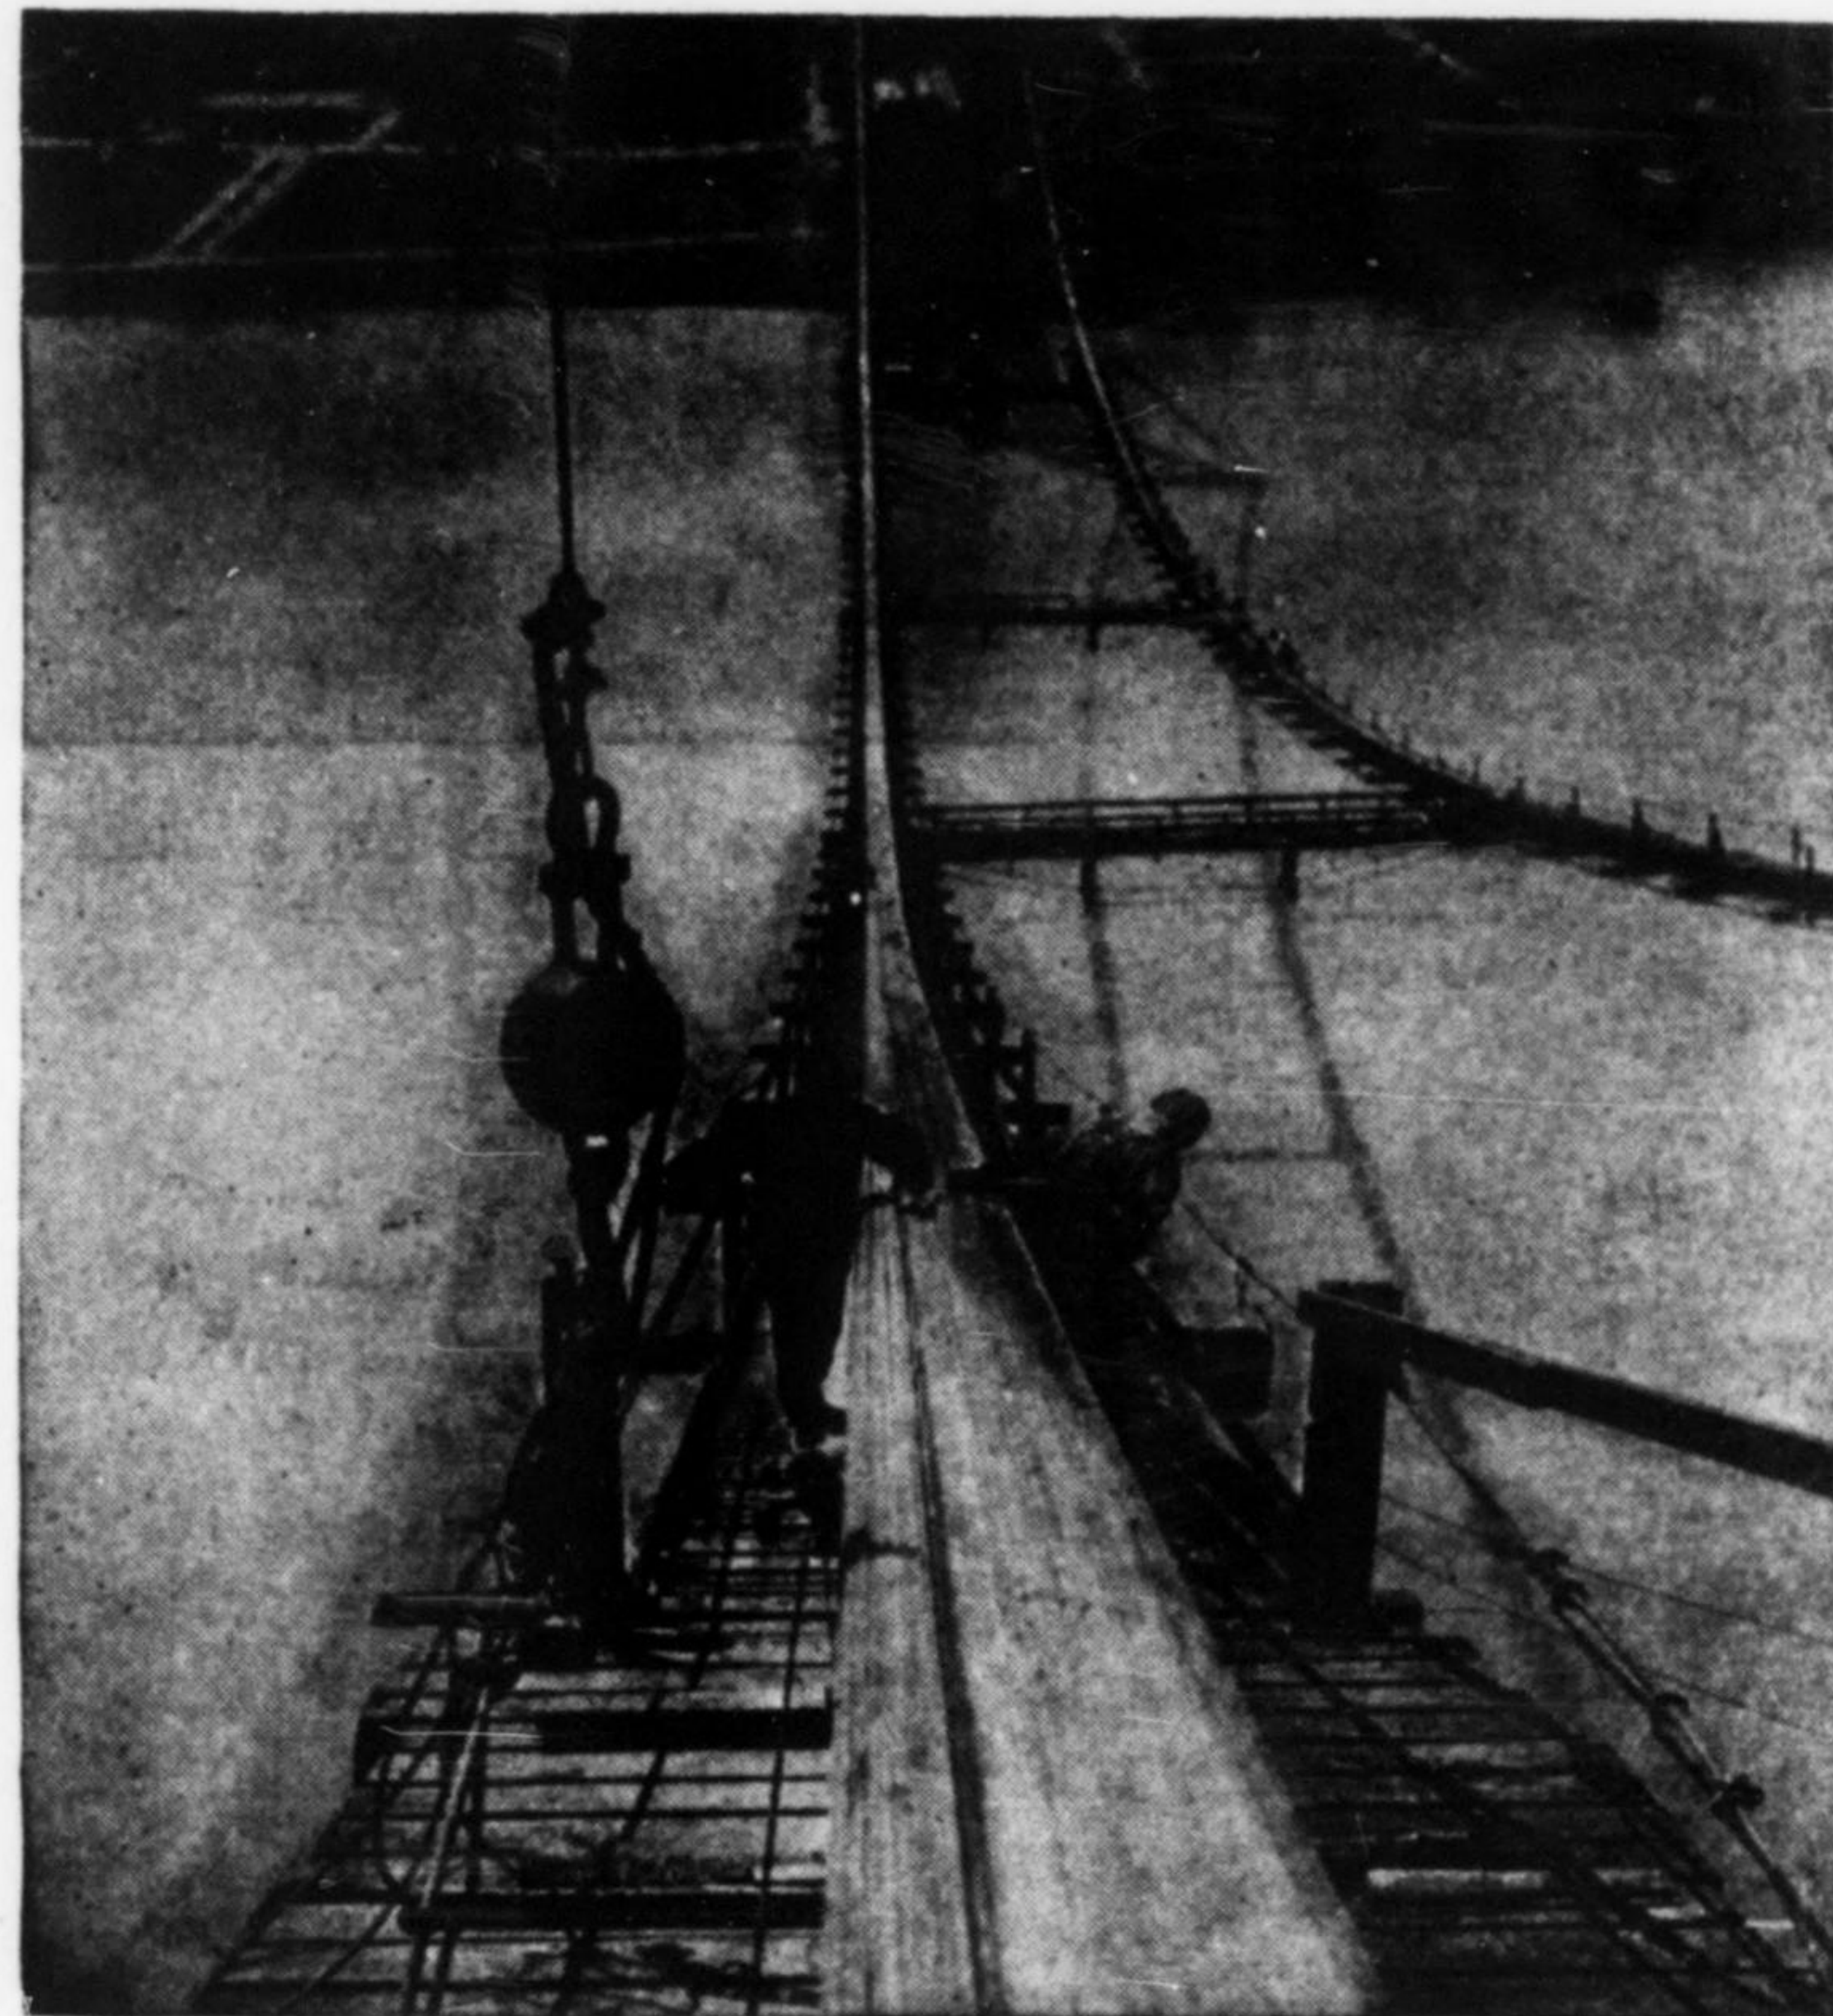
TWO 30-FT. LENGTHS OF CABLE STRAND COMING UP FROM DETROIT MAIN SPAN ON SLED Wire lowered at main tower to gondola cars in railroad yard below.
